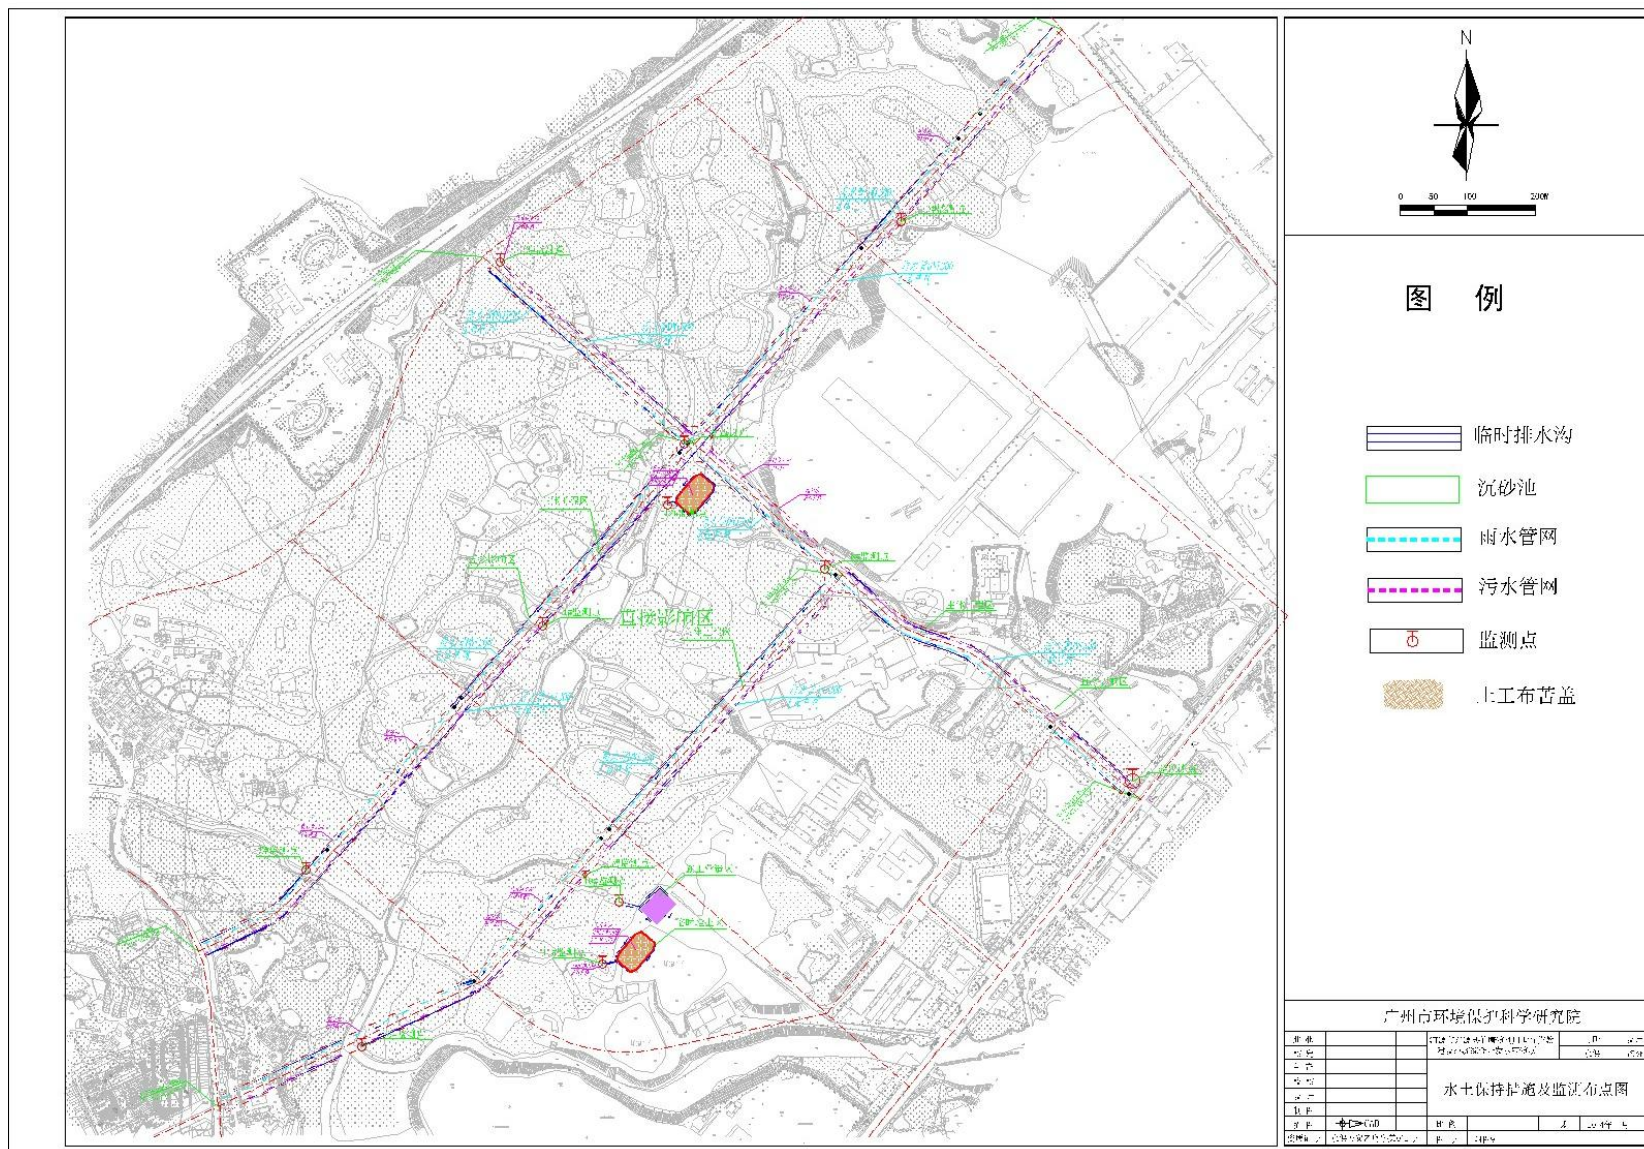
Overall layout of measures for prevention of water and soil loss
